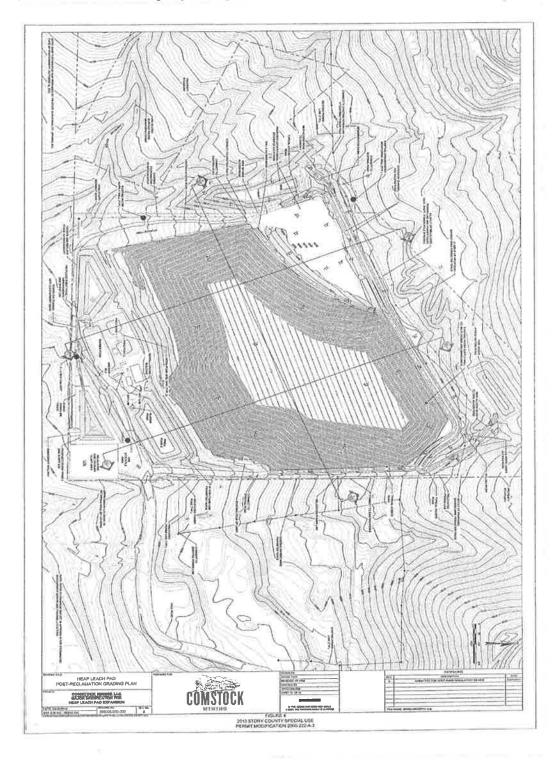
Exhibit C: Aerial image with processing site overlay and site drawings (Specific site plans within the SUP boundaries may vary)
